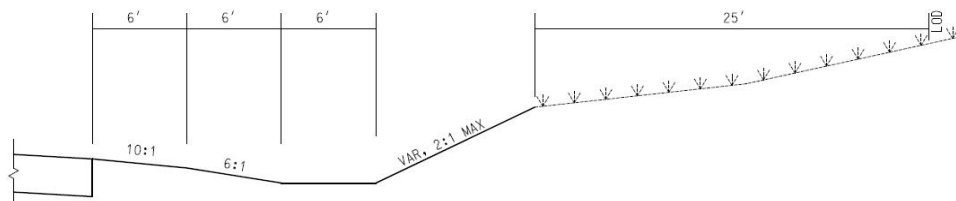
Roadside Grading Typical Section (Cut Slope with Ditch)
